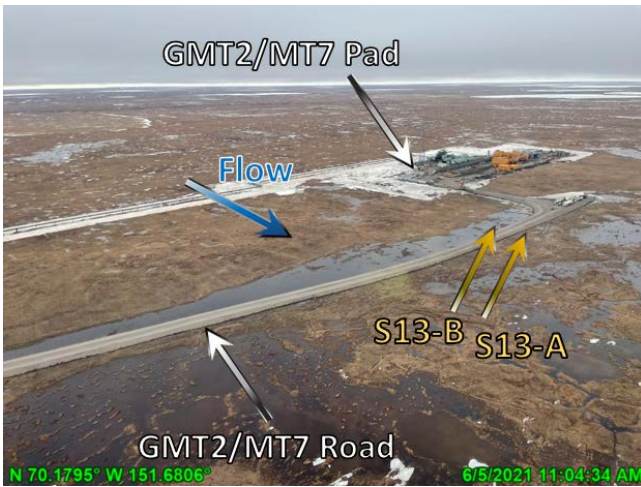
ponding along road embankments at S13, looking south (upstream); June 5, 2021
